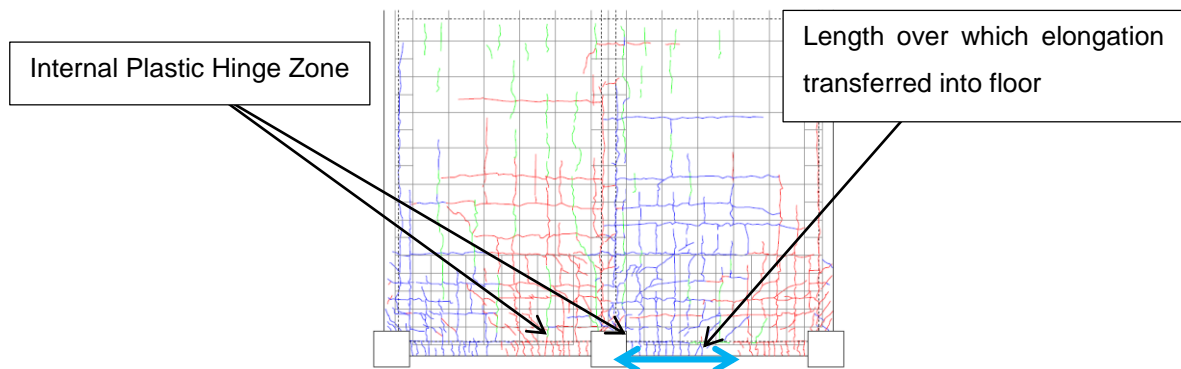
Observed crack pattern in floor plate at 2% drift Peng et al. (2008)
